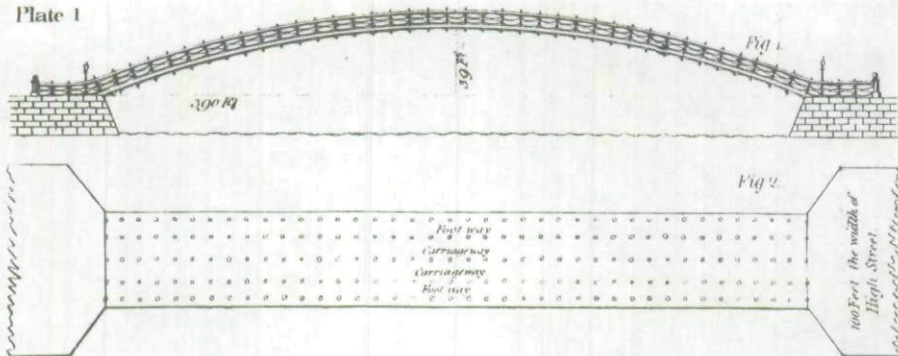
Patent bridge (Charles Willson Peale, *Essay on Building Wooden Bridges*, Philadelphia, 1797).
